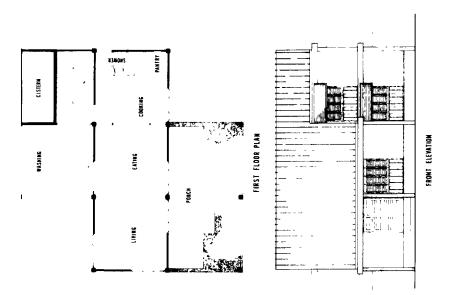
PLAN AND ELEVATION FOR HOUSE, MODEL "B."
